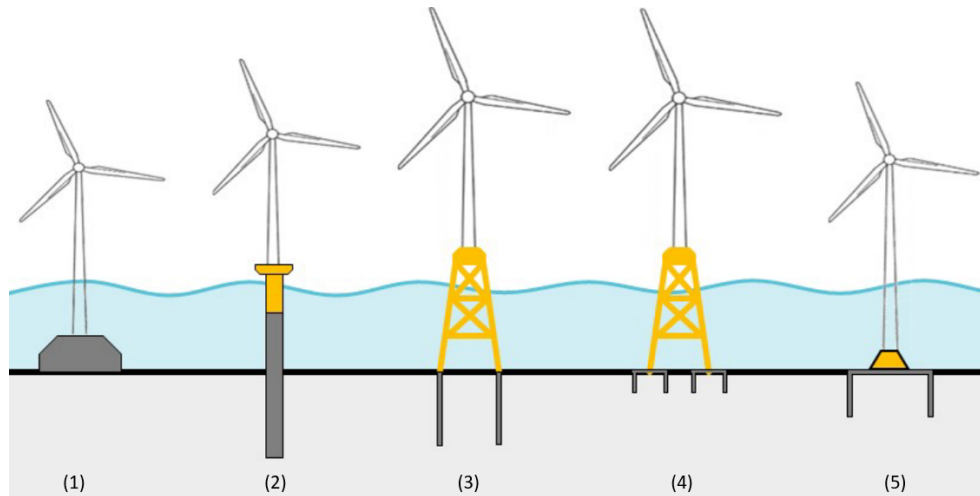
Typical foundations (1) gravity-based (2) monopile, (3) piled jacket structure, (4) suction caisson jacket structure (5) mono caisson (Skau et al., 2018)
